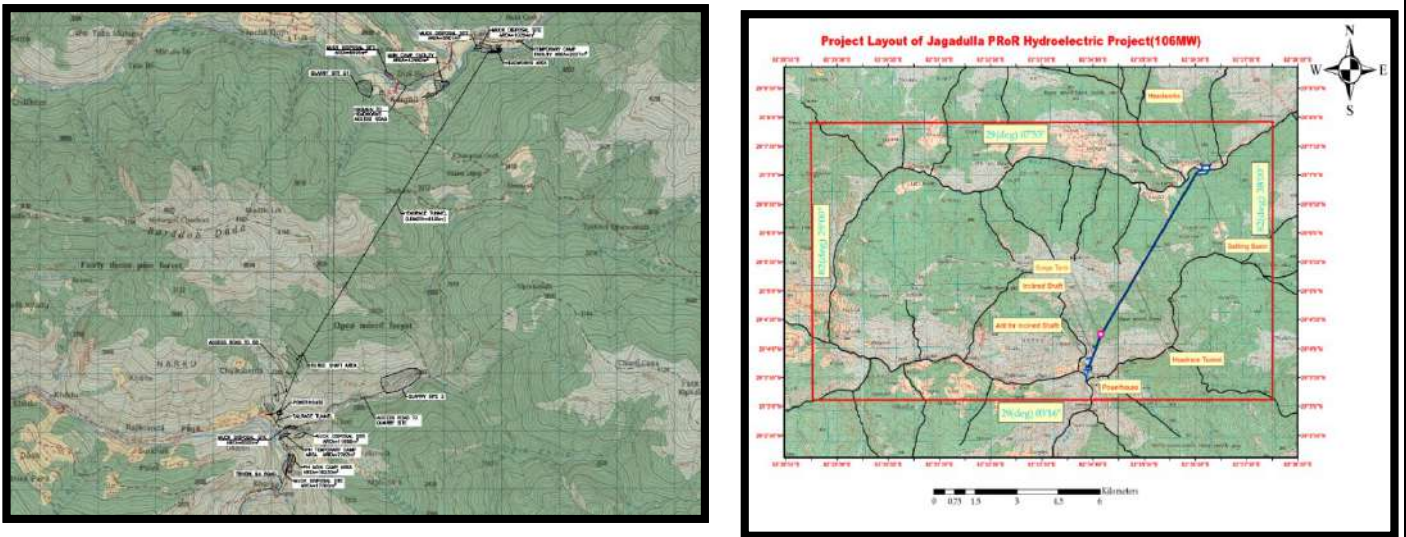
Layout & Plan of Jagdulla Hydroelectric Project
